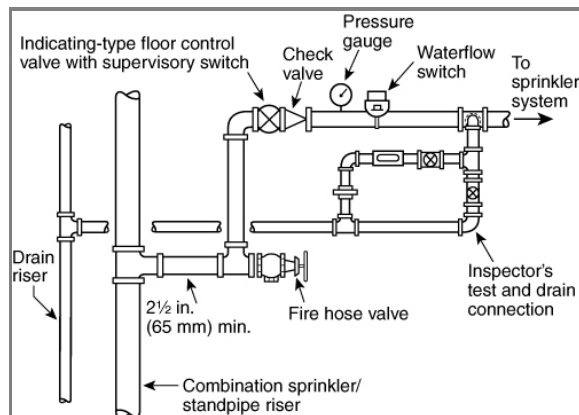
(b) Acceptable Piping Arrangement for Combined Sprinkler/Standpipe System.
